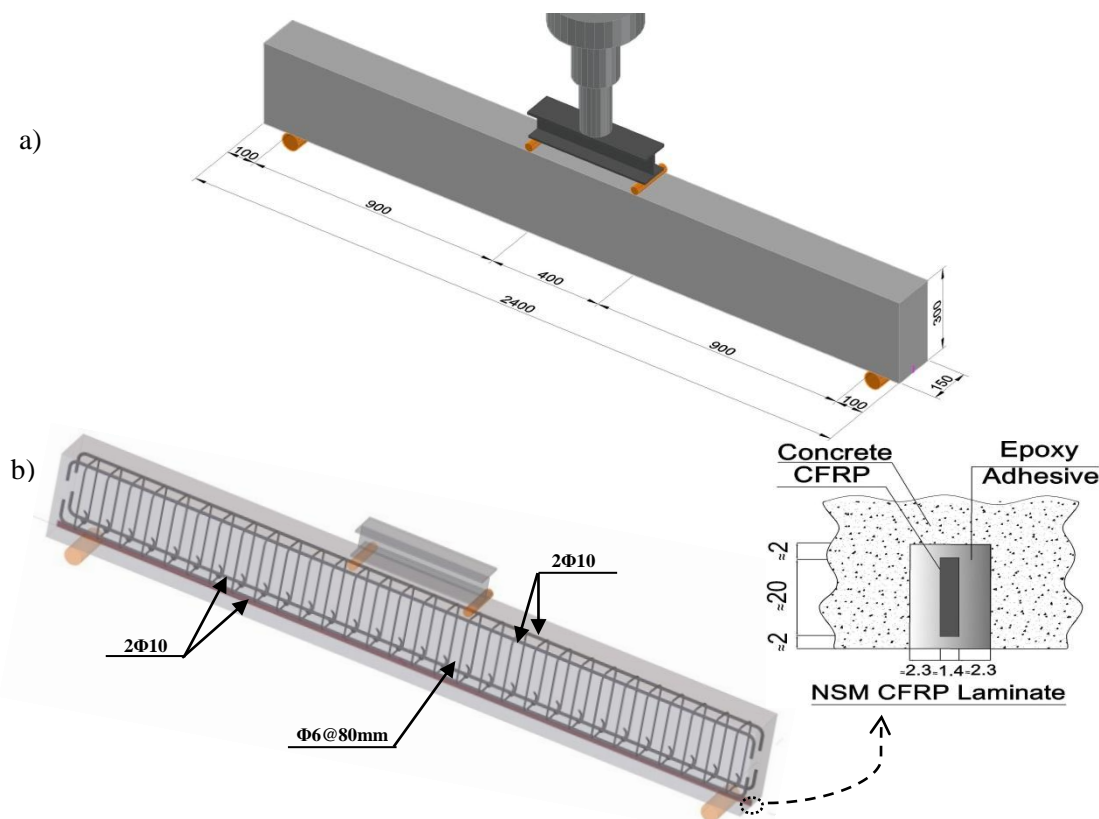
Beams of the experimental program: a) geometry, loading and support conditions, b) reinforcement details
